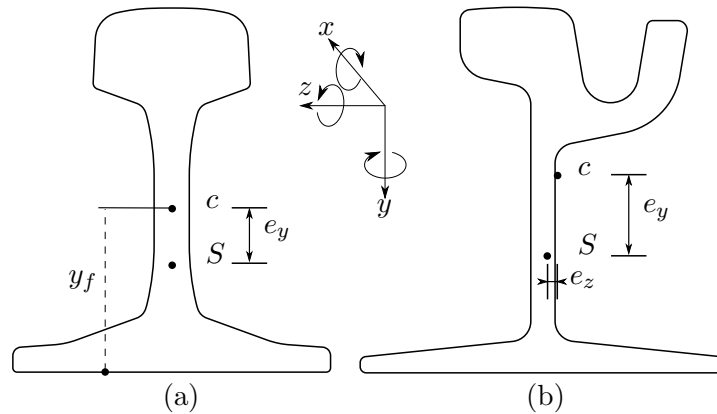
Typical rail cross-section for a) 60E1 and b) 60R1 rail profiles
